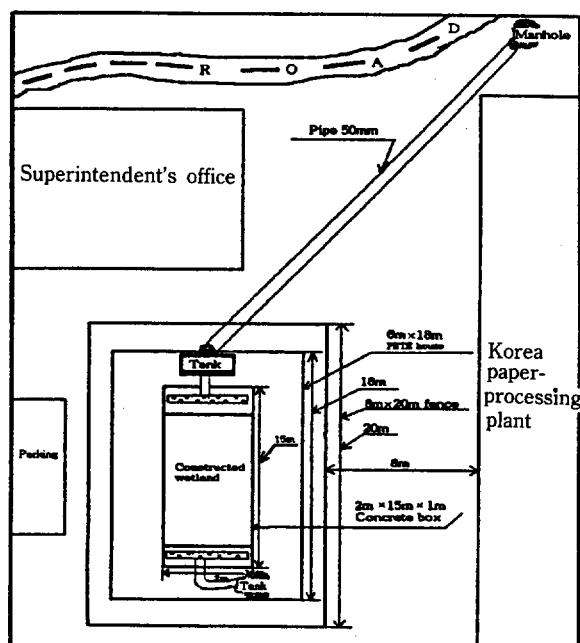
Layout of the pilot plant at Baeksuk Nongkong-Danzi.
